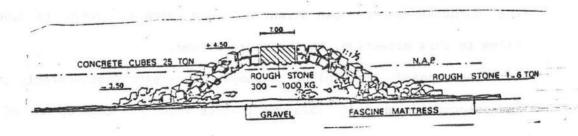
Typical Cross-Section of South Pier at Scheveningen Harbor
